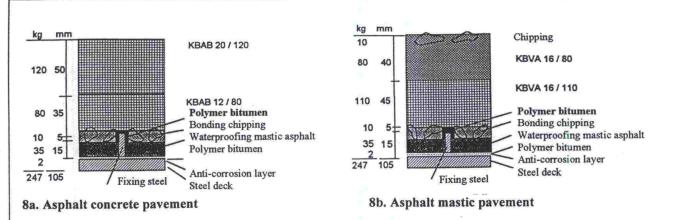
Surface structure of a roadway on a bridge with steel deck with fixing steel components
